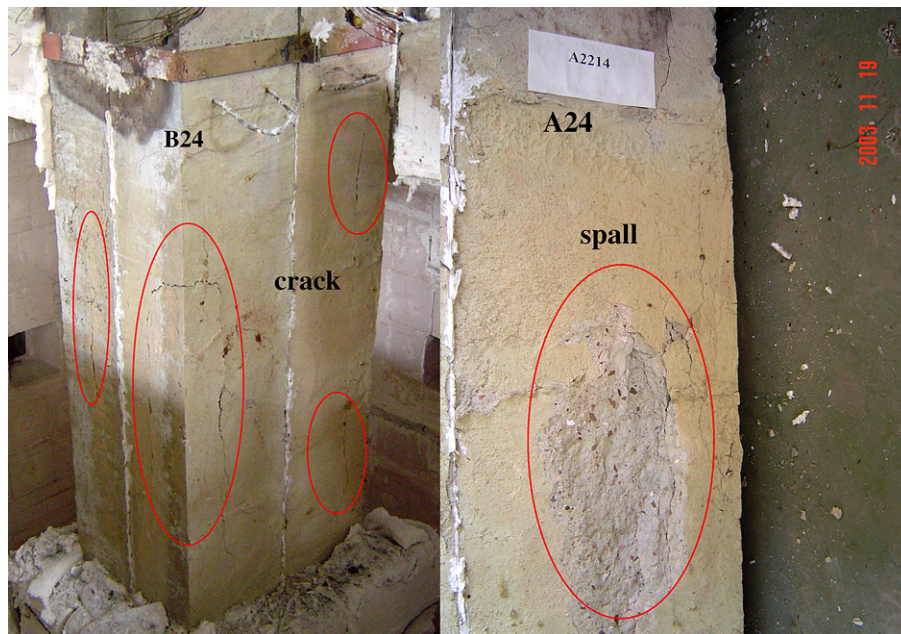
Crack and spalls of specimens after fire test.
